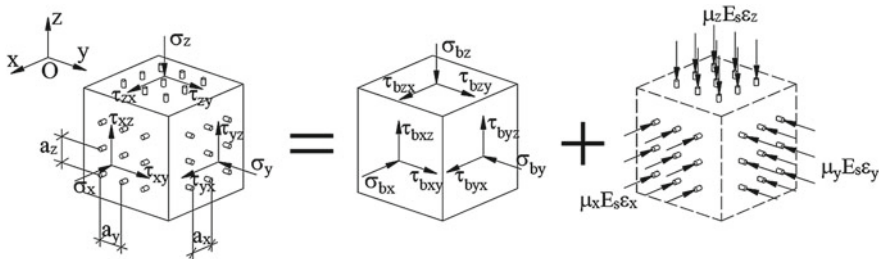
Scheme for determining normal stresses in concrete and reinforcement
